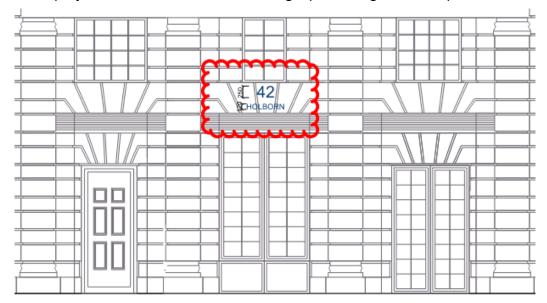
revised proposal to front elevation (1 x non-illuminated fascia sign outlined in red)
